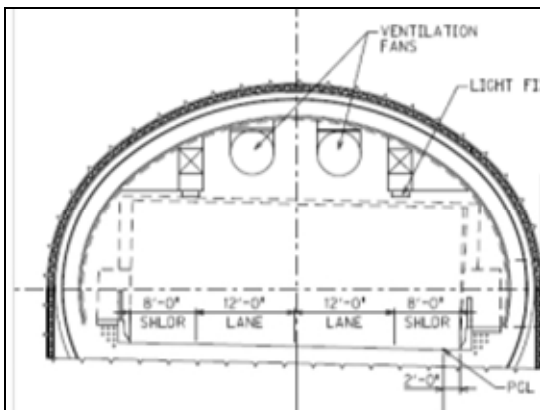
A Typical Tunnel Cross Section Excavated using SEM
